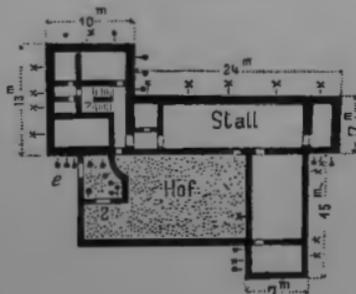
Plan of a defended barracks. Scale 1/800.
